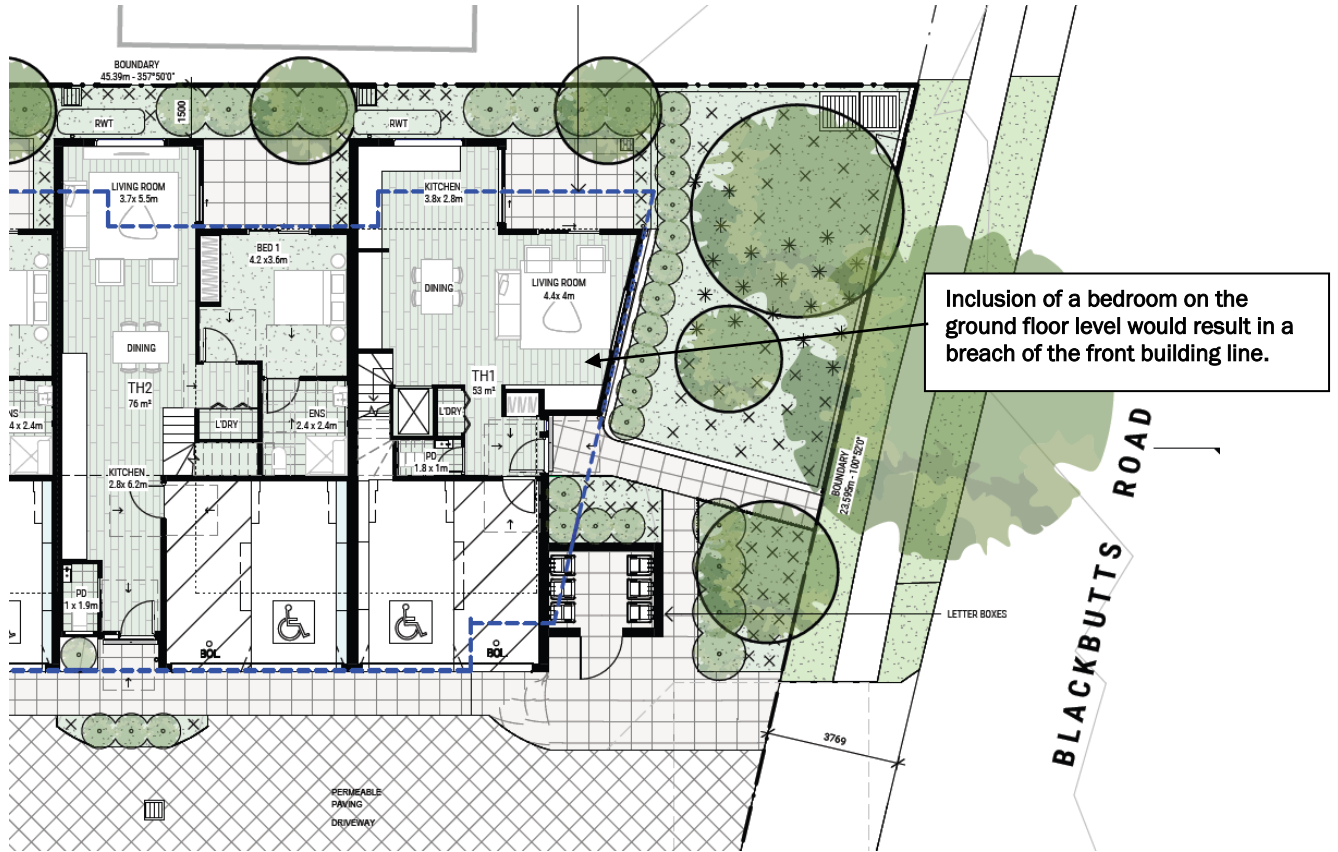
excerpt of the ground floor plan showing the configuration of dwelling 1, the lift, and the location of the front setback
